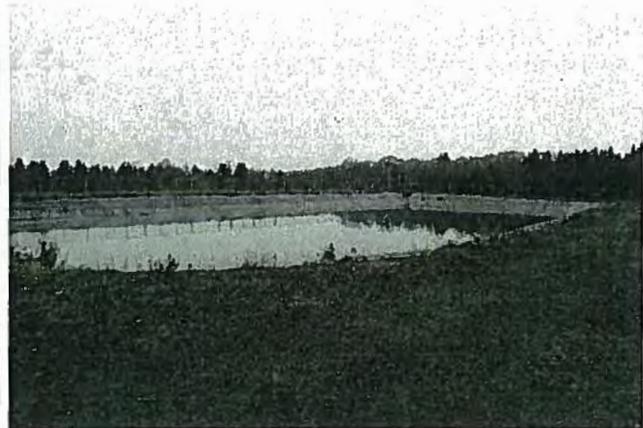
Knockholt Landfill Leachate Pond (photo by Tetra Tech 2017)
